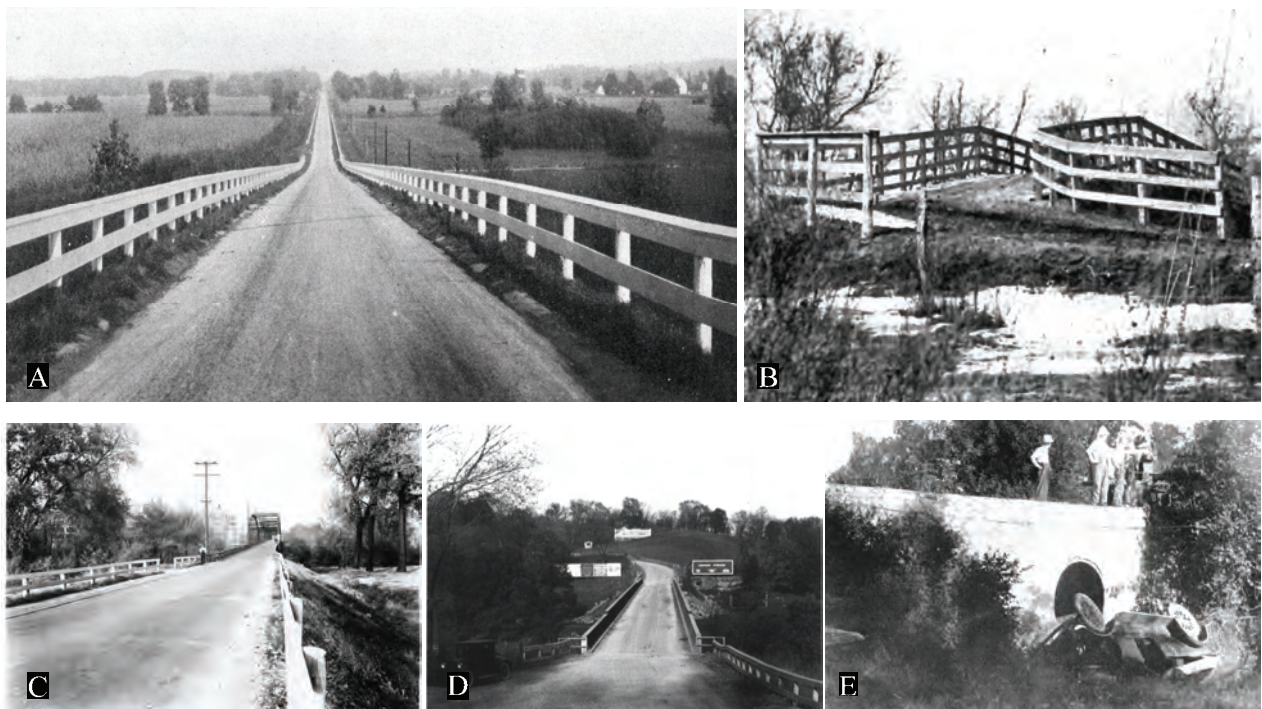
A. Wooden highway fencing (ISHC 1923f:8). B. Plank topped fencing used on overhead railroad crossing. Caption reads “Dangerous Turn in Overhead Crossing—Van Meter Crossing, Dallas County.” C. Fencing atop berm on approach to unknown bridge location ca. 1928 (Iowa DOT Library). D. Plank top fencing used on approach to unknown bridge location ca. 1930 (Iowa DOT Library). Note poor design as fencing does not meet edges of bridge sidewalls. E. “No Rails” (ISHC 1922a:9).
